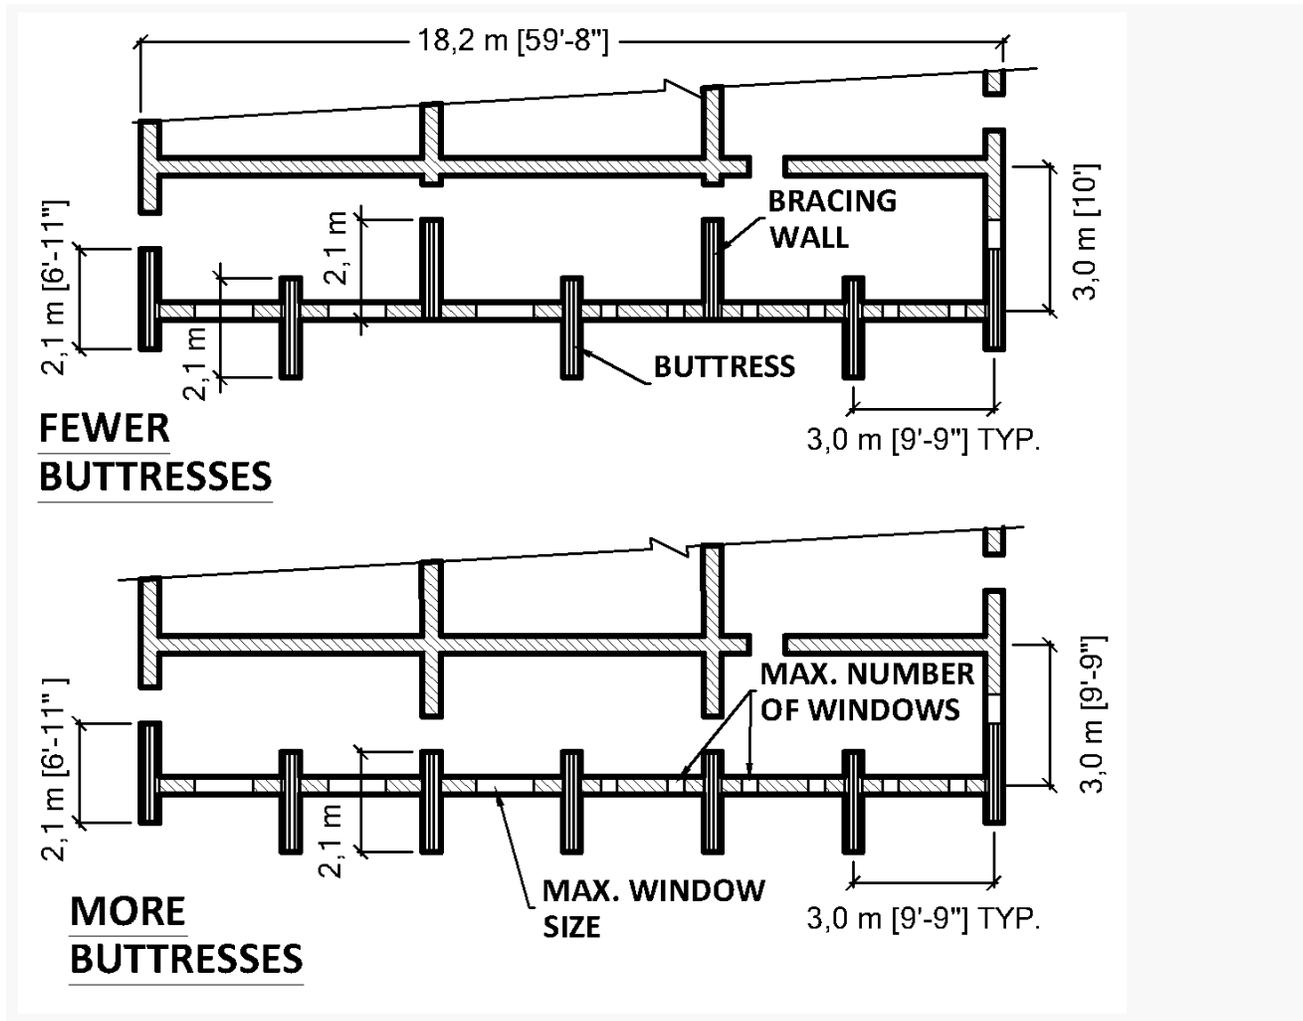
Examples of bracing panel sizes at 3 m (9'9") bracing line distances (above to below): a- Few buttresses and doorways distant from wall being braced; b- More buttresses and doorways closer to wall being braced.
